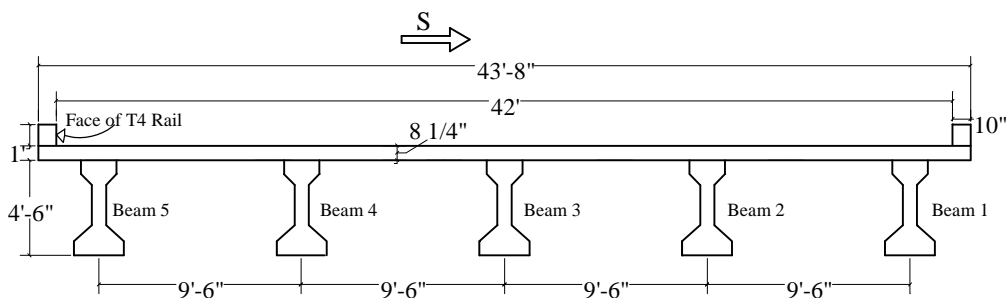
Cross Section of the Instrumented Span at the Nolanville Bridge
